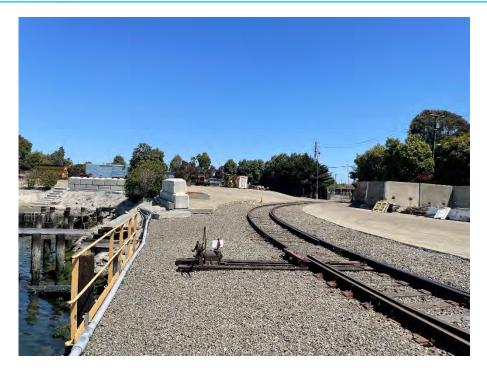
Looking north toward SW-6. No significant cracks or deterioration noted in the area. Gravel cover along railroad tracks appears adequate, with no underlying geotextile exposed.
